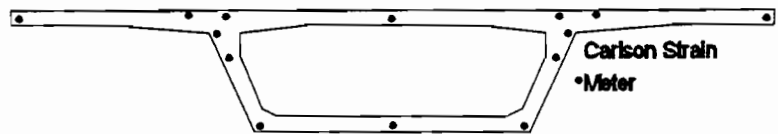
Denny Creek Bridge Carlson gage layout.
